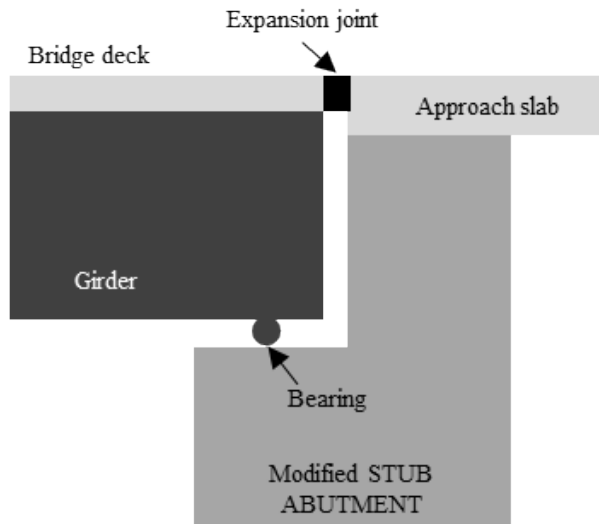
Schematic of the proposed detail for 'modified stub abutment'.
